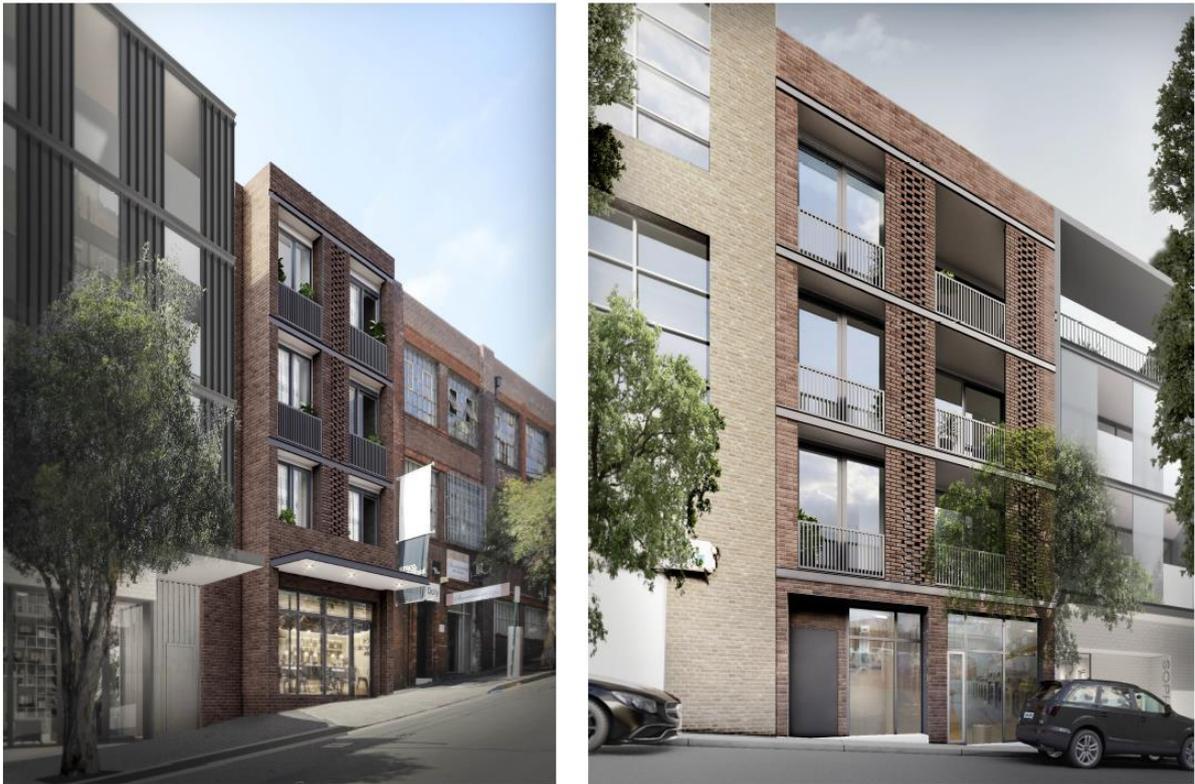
Proposed photomontage - Kippax Street (left), Sophia Street (right)
